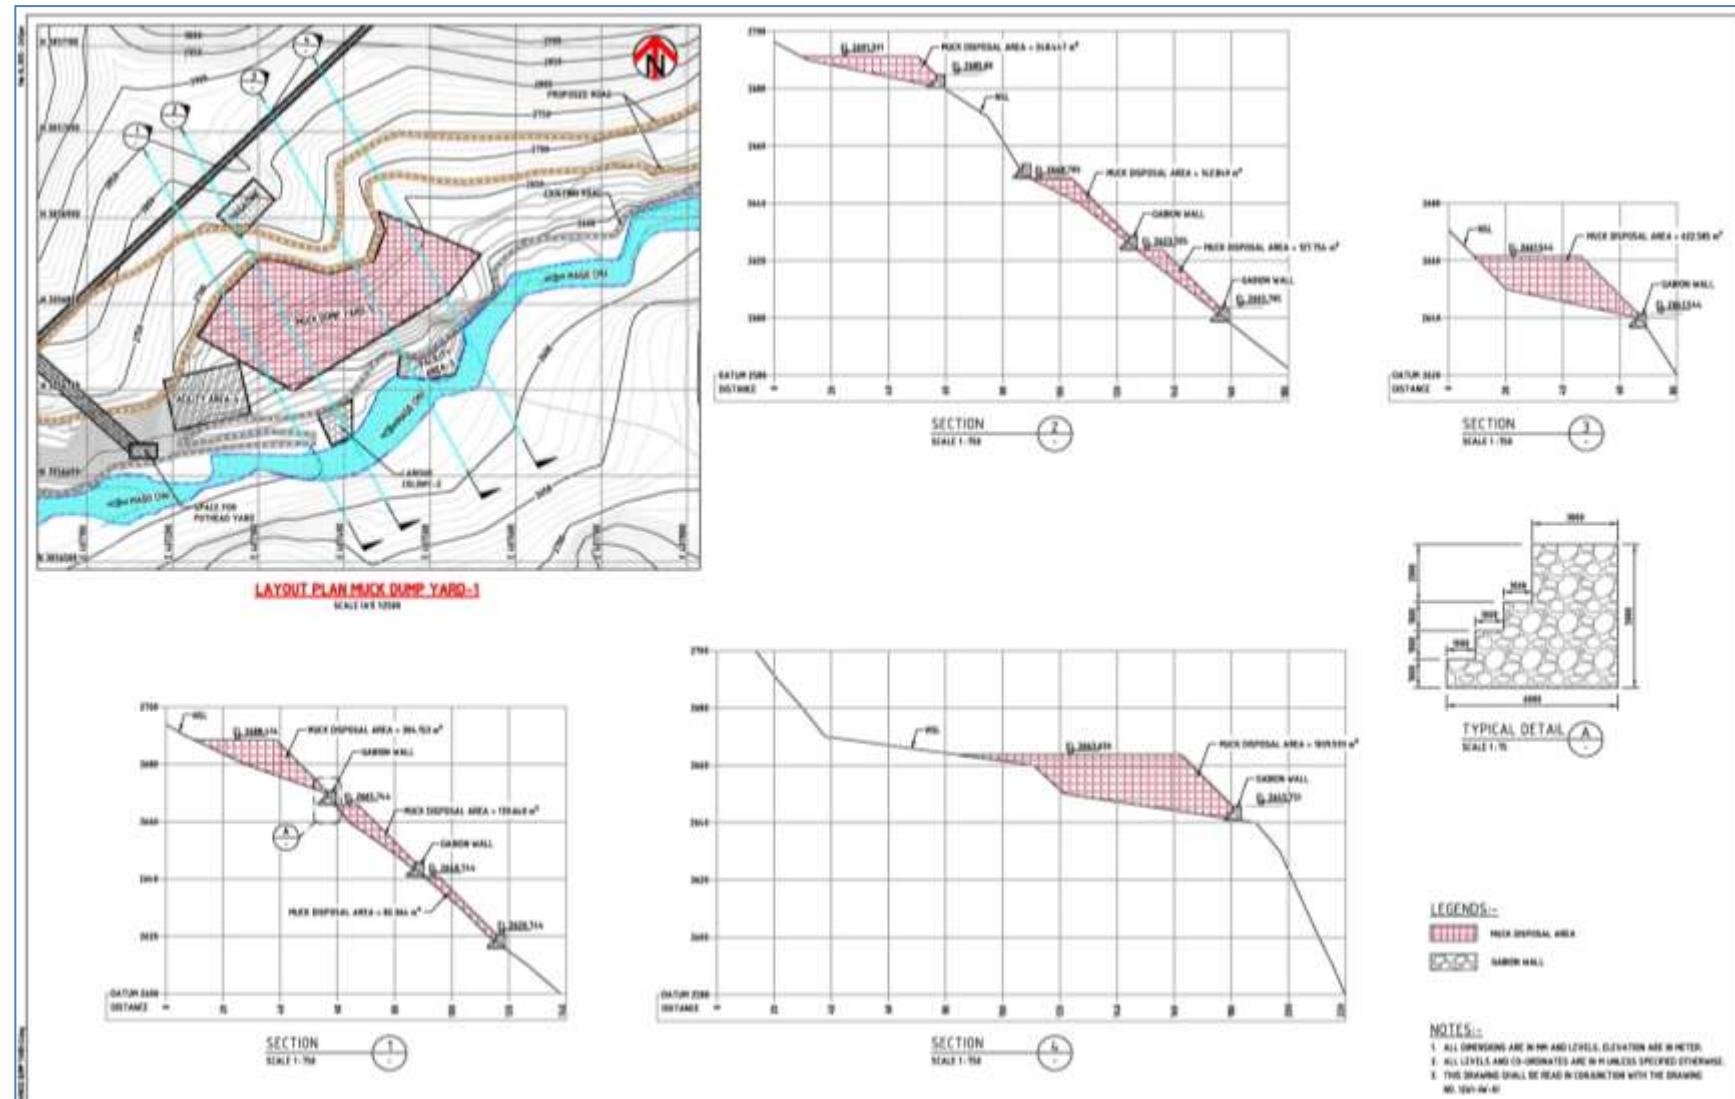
Layout Plan of Muck Disposal Site - 1
